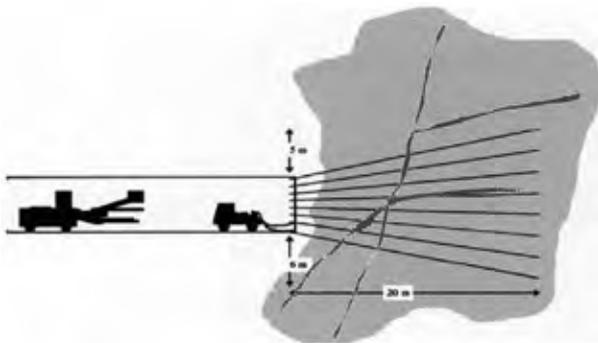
Grouting umbrella as applied in Nordic tunneling [1].
